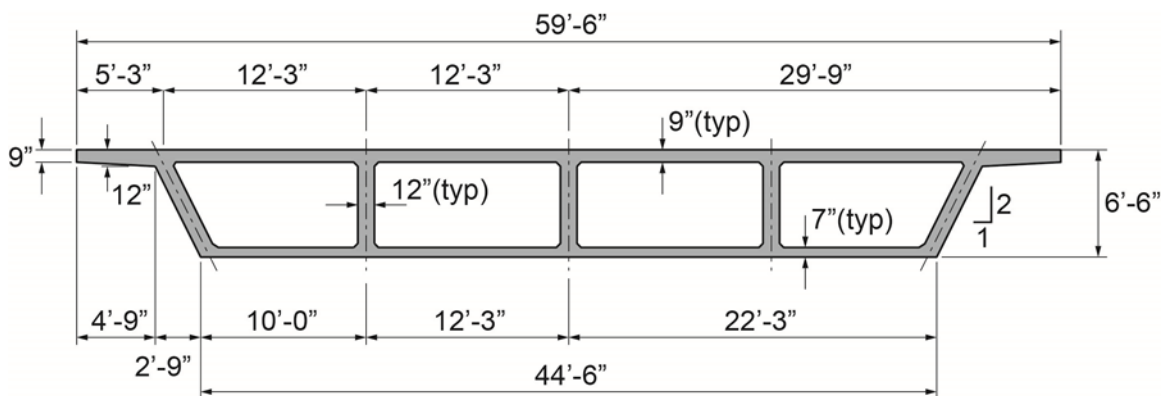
Example Cross Section Dimensions for Preliminary Design
